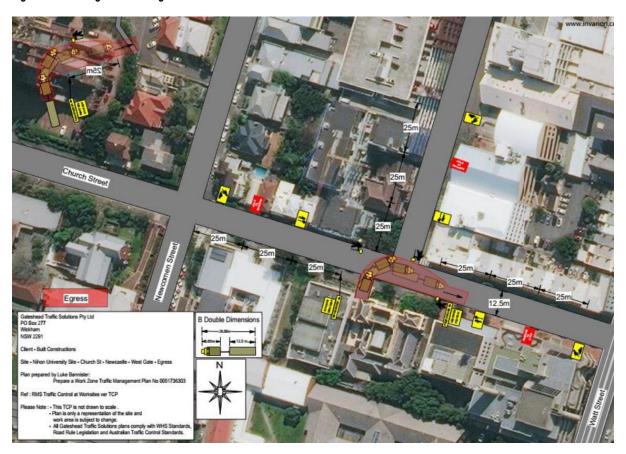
Building C vehicle egress from site to Church Street under traffic control
